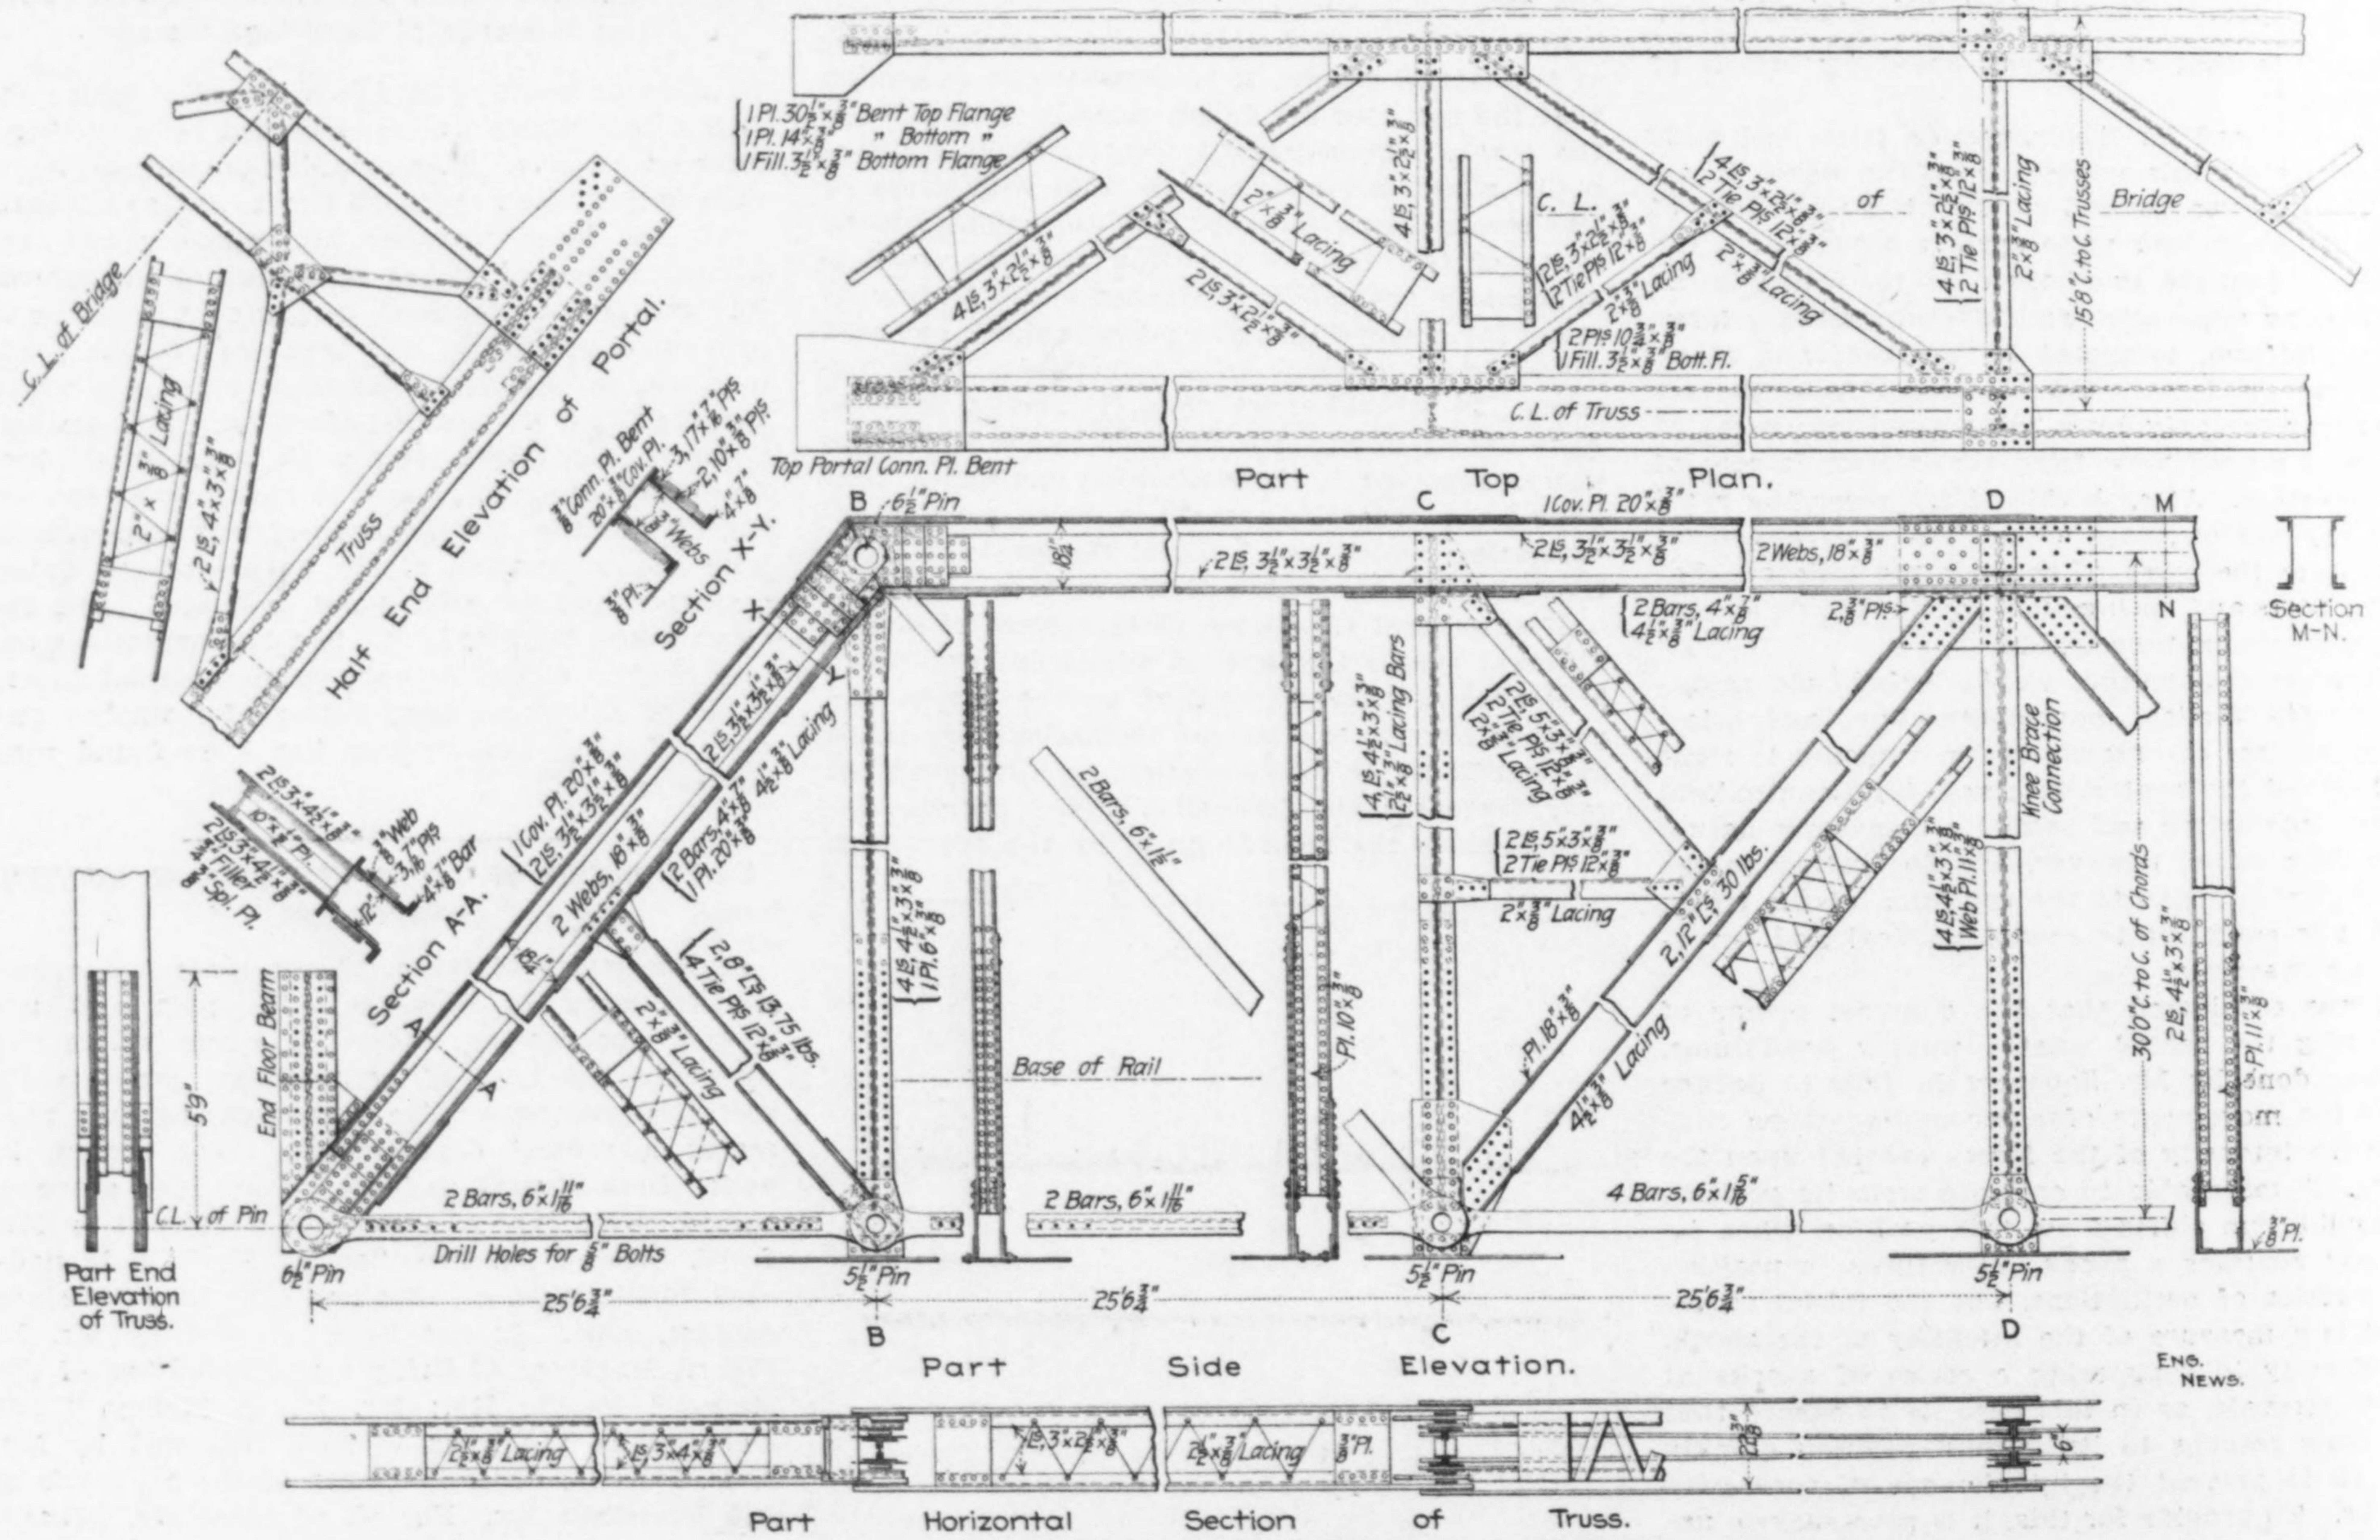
HALF SIDE ELEVATION OF SCHAUB TRUSS.
